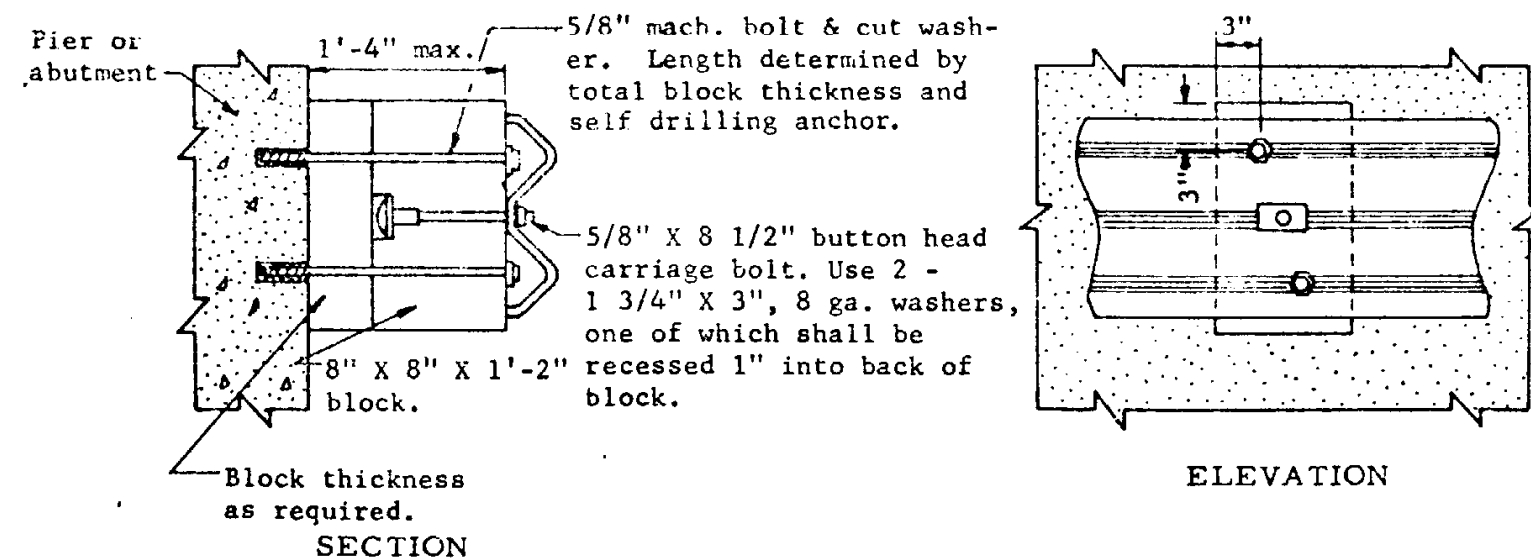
GUARD RAIL POST INSTALLATION ON STRUCTURES
